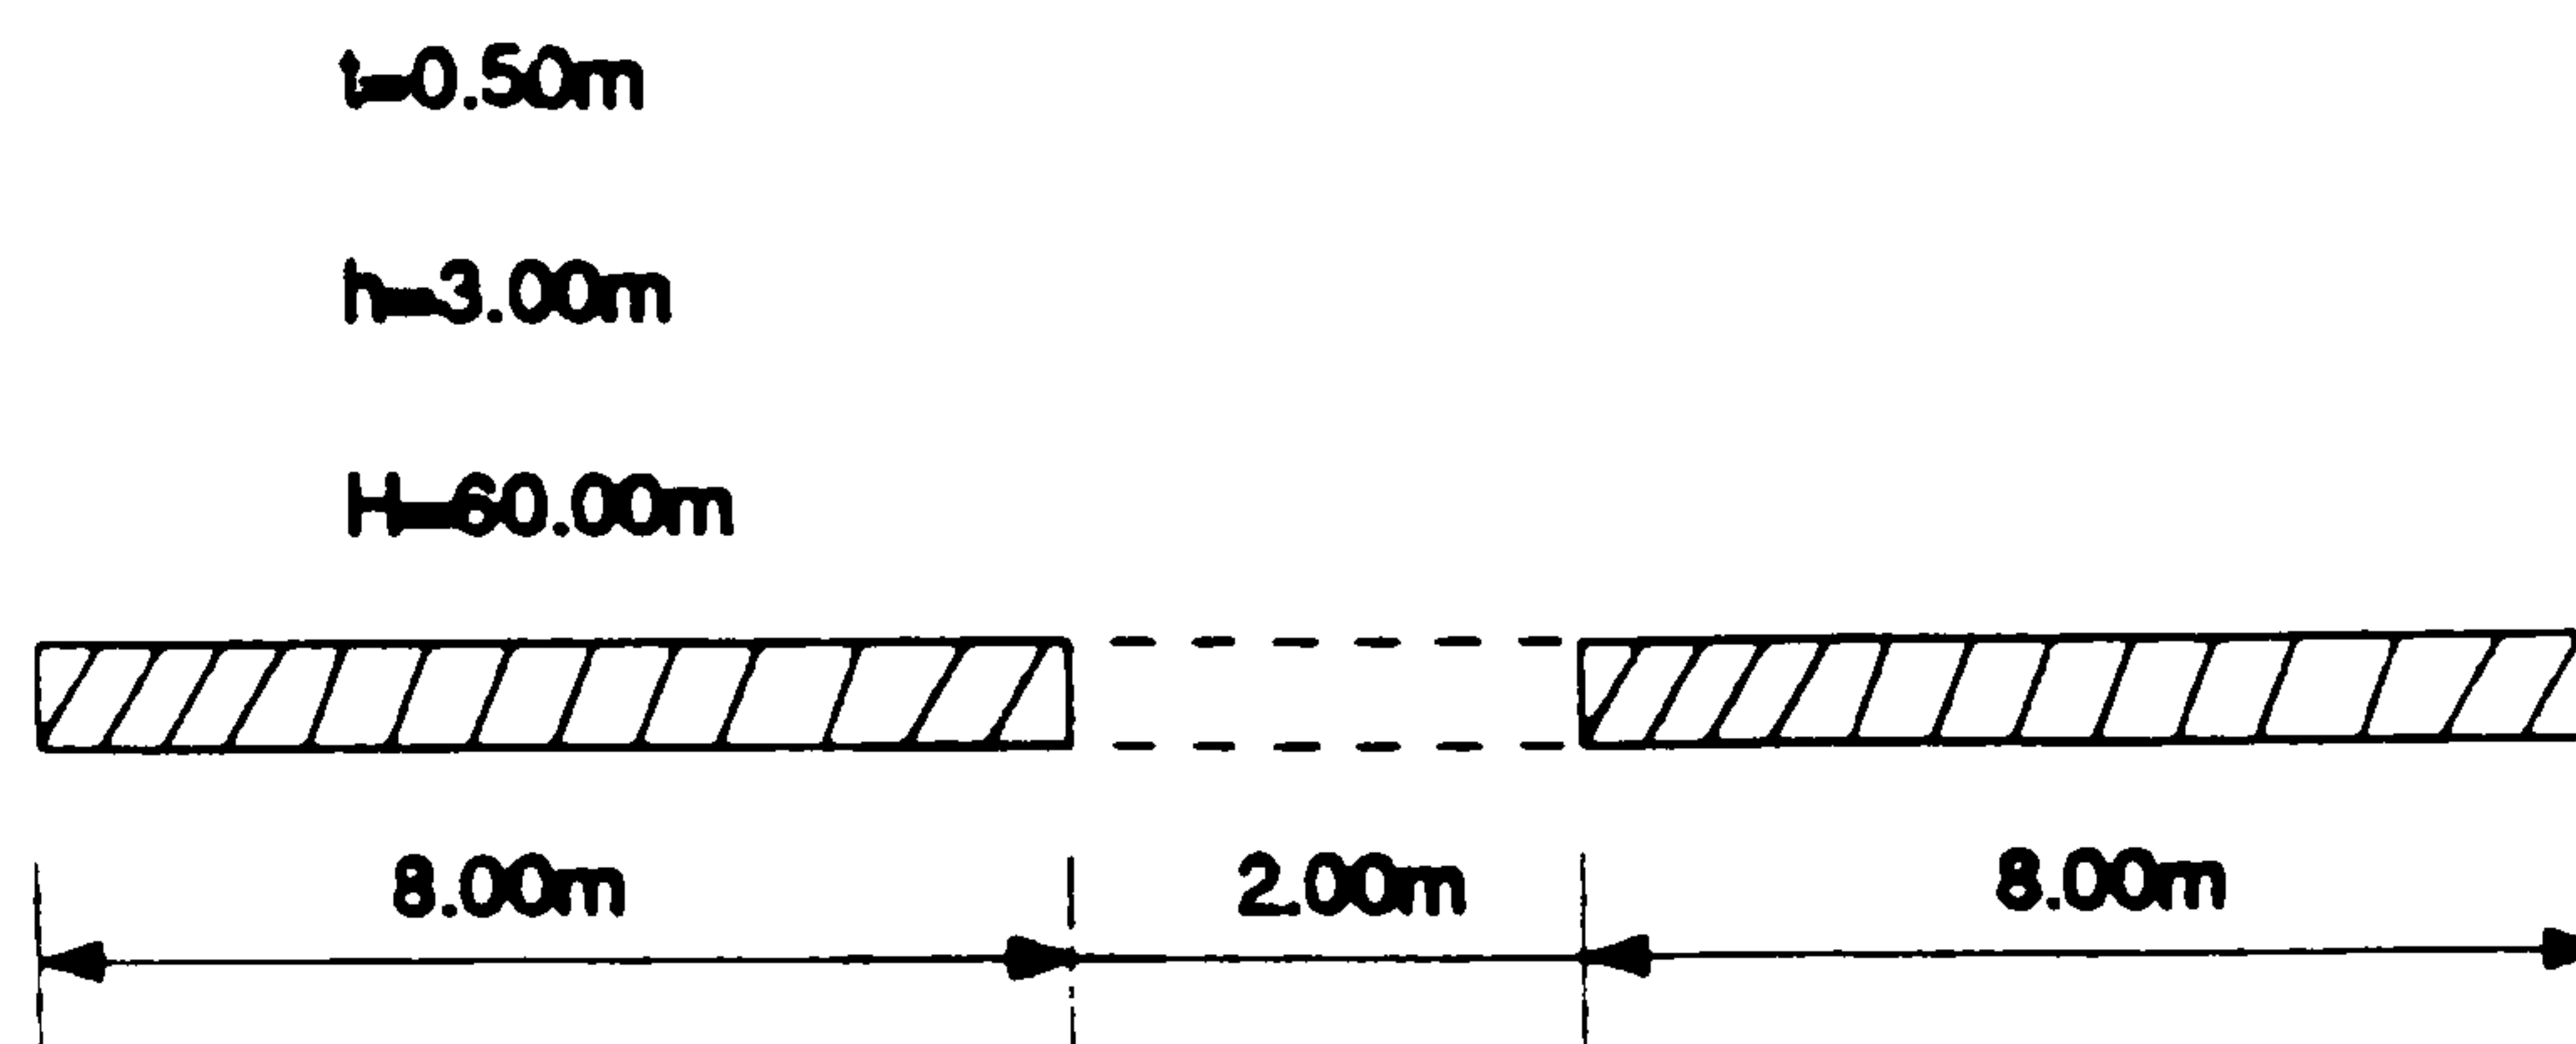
Design of the top stiffening beam on shear wall structure. Coull [25]
